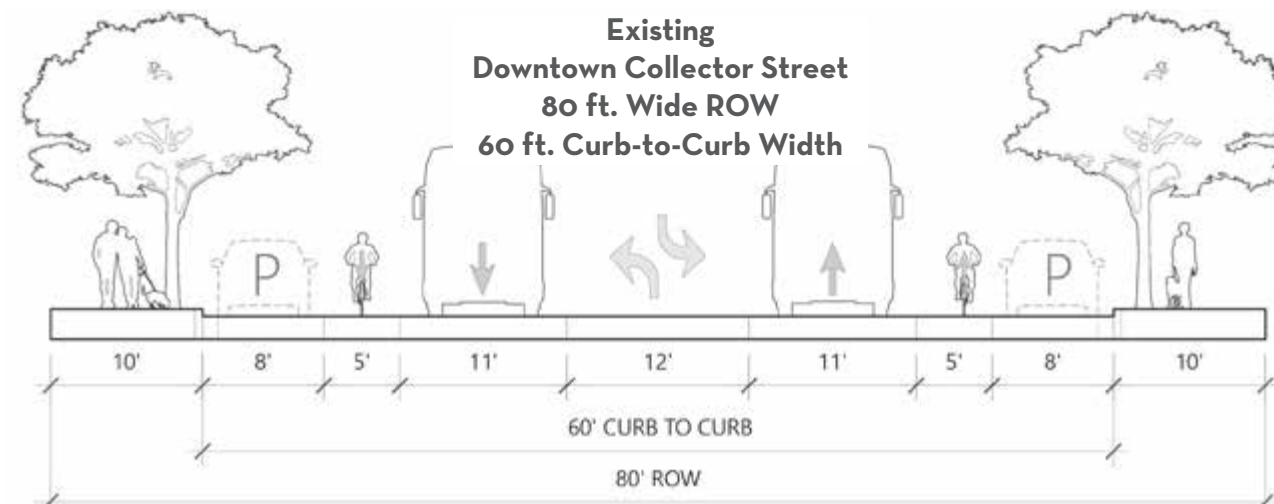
Existing: Typical Downtown Collector Street with a 80 ft. wide ROW and 60 ft. wide curb-to-curb. See Chapter 8D-1 Roadway Reconfigurations for minimum travel lane widths.
